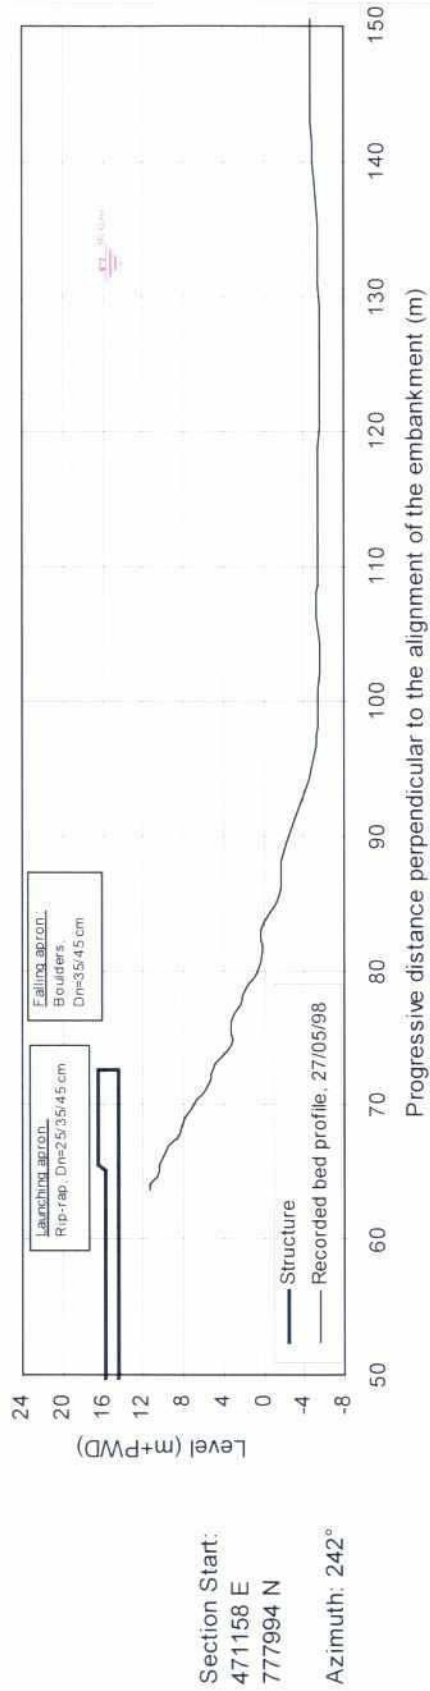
Steepest slope surveyed in Section F and G
